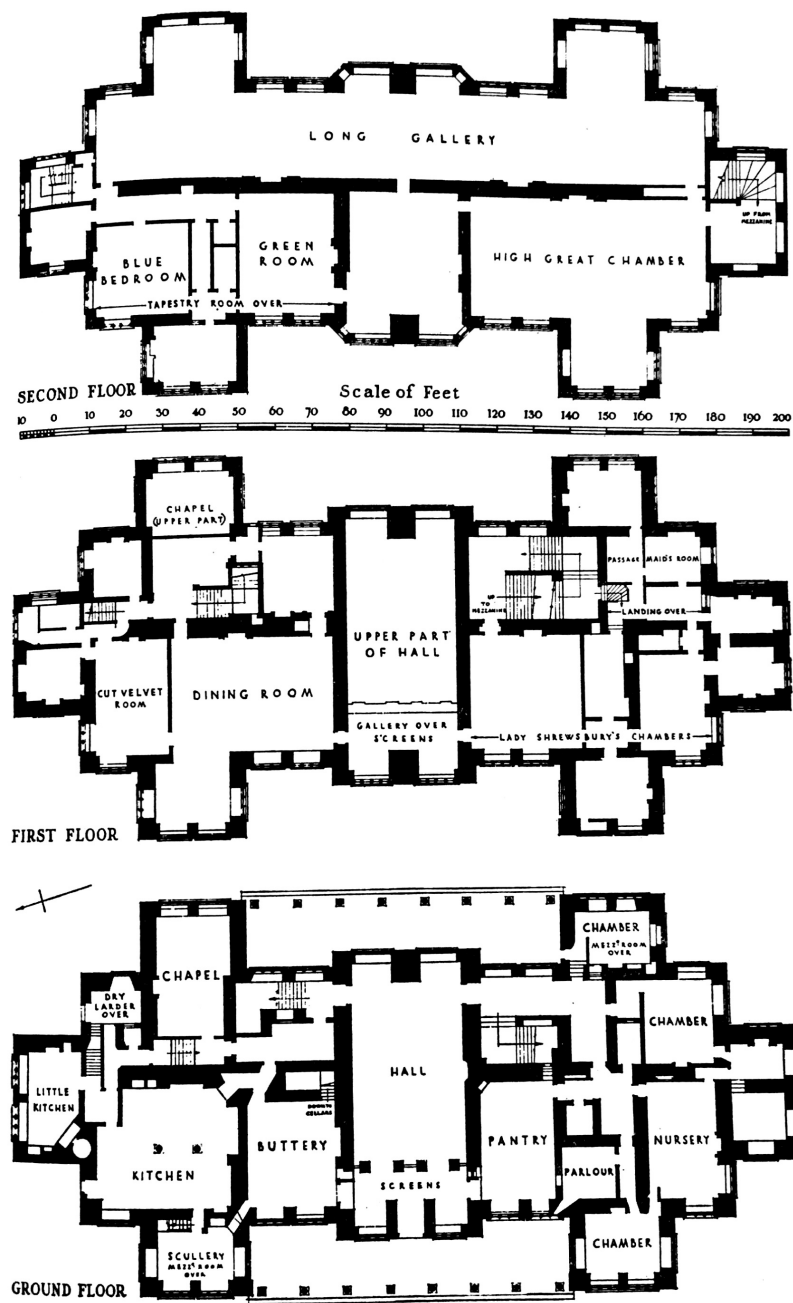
Hardwick Hall. Ground, first- and second-floor plans.
